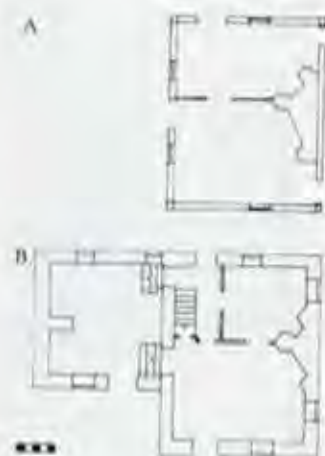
Penn Plan houses. A. Log Penn Plan house, vicinity of Marple, Delaware County, Pennsylvania, built late-eighteenth century. B. Three-room plan variant of Penn Plan hall-parlor house type, vicinity of Marshallton, Chester County, Pennsylvania, mid-eighteenth century.
